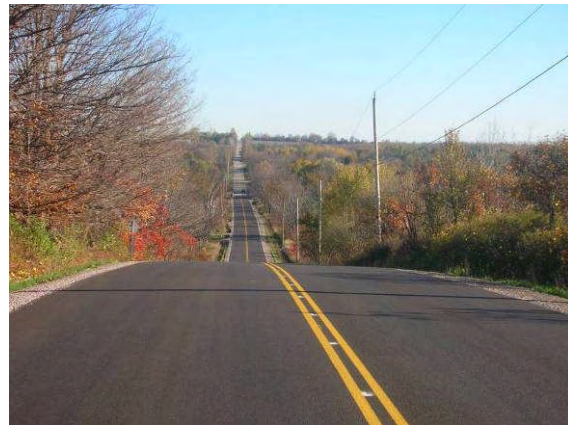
33: Business along Campbellville Road      Photo 8 - 34: 'Roller-coaster' alignment along this route link on Campbellville Road
